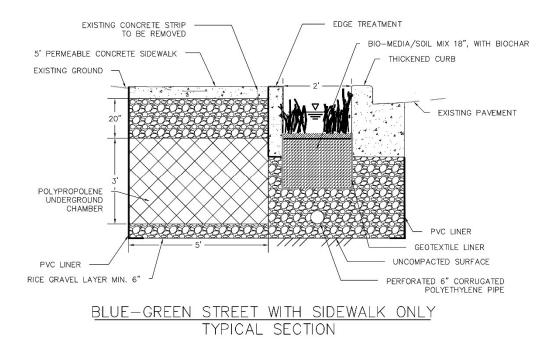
Blue-green street typical section with bio-strip, permeable concrete sidewalk, and an underground storage tank
